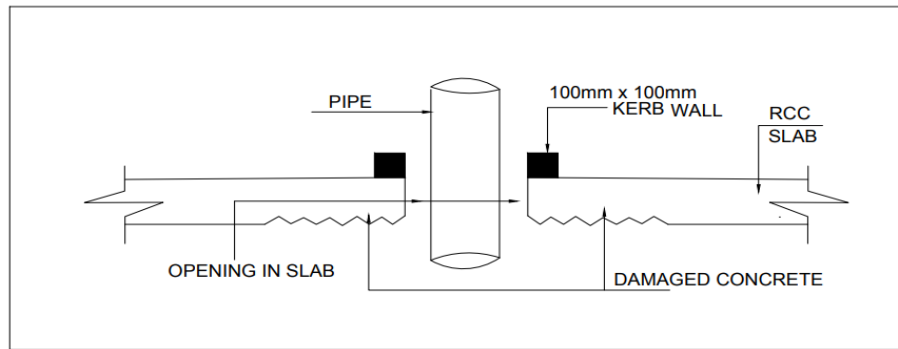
Sectional view of slab opening with kerb wall of 100 mm x 100 mm all around
